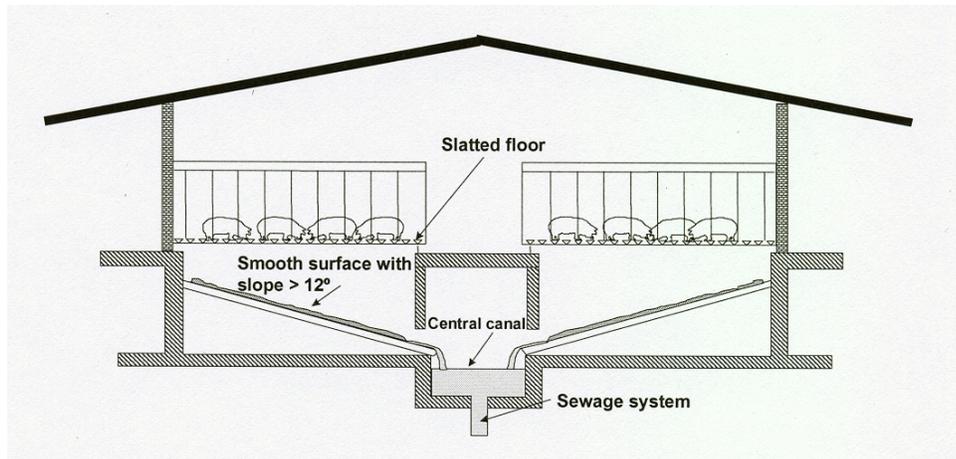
Example of flat decks with fully-slatted plastic flooring and sloped concrete floor underneath to separate faeces and urine (CRPA, 2003).
